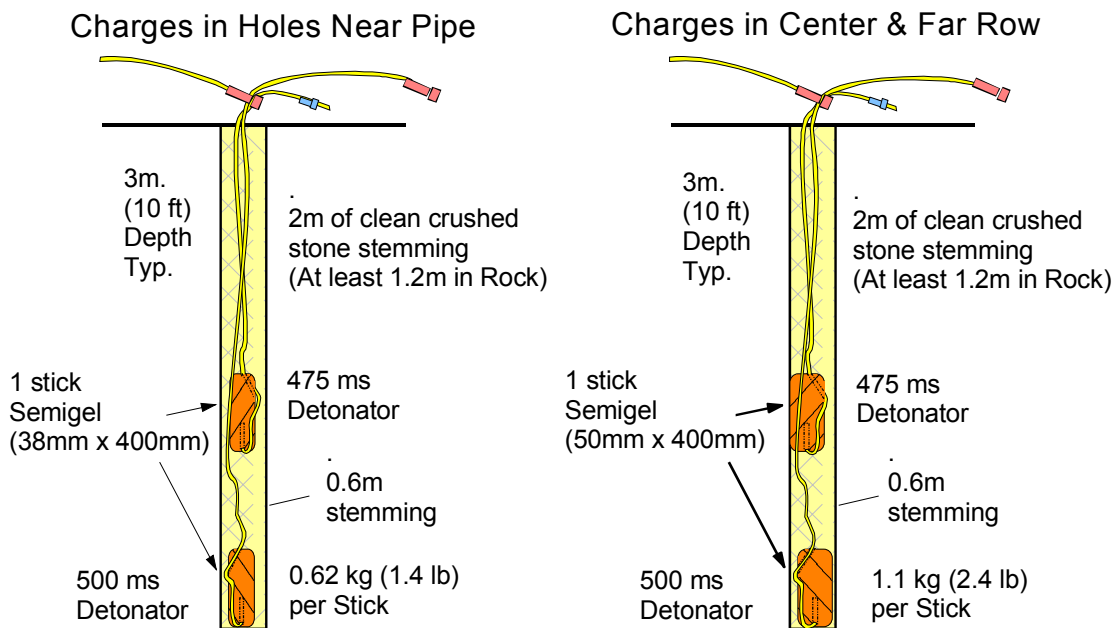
Arrangement of Delay-Decked Charges for Trench Blast near Water Pipe
